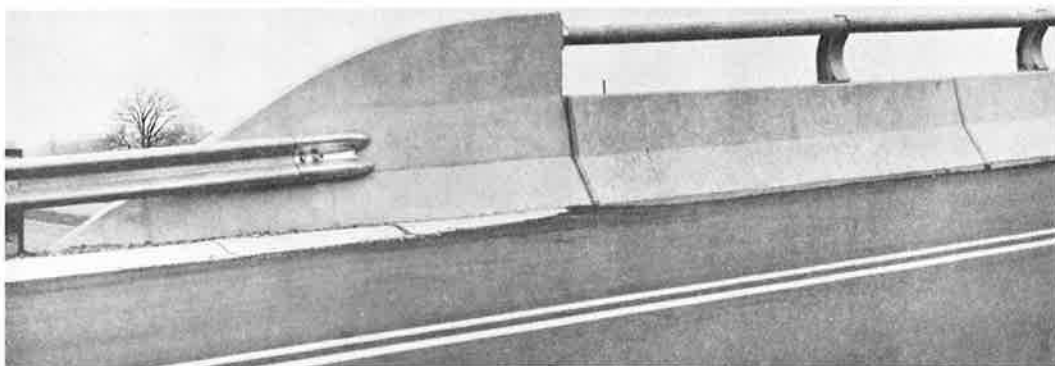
View of bridge rail end wall and blending of adjacent guardrail.
